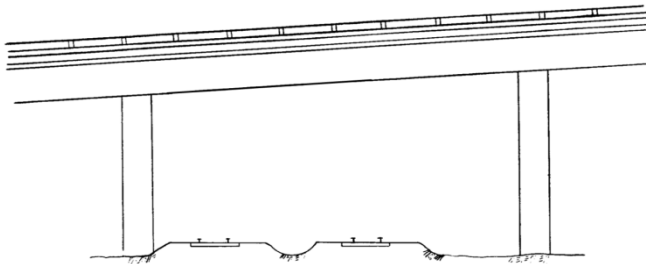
Bridge elevation view with two freight/passenger rail tracks below the bridge.
